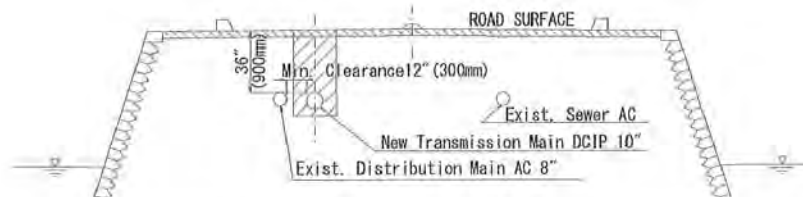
Typical Section of Additional Water Transmission Main-4 (Malakal Causeway)
